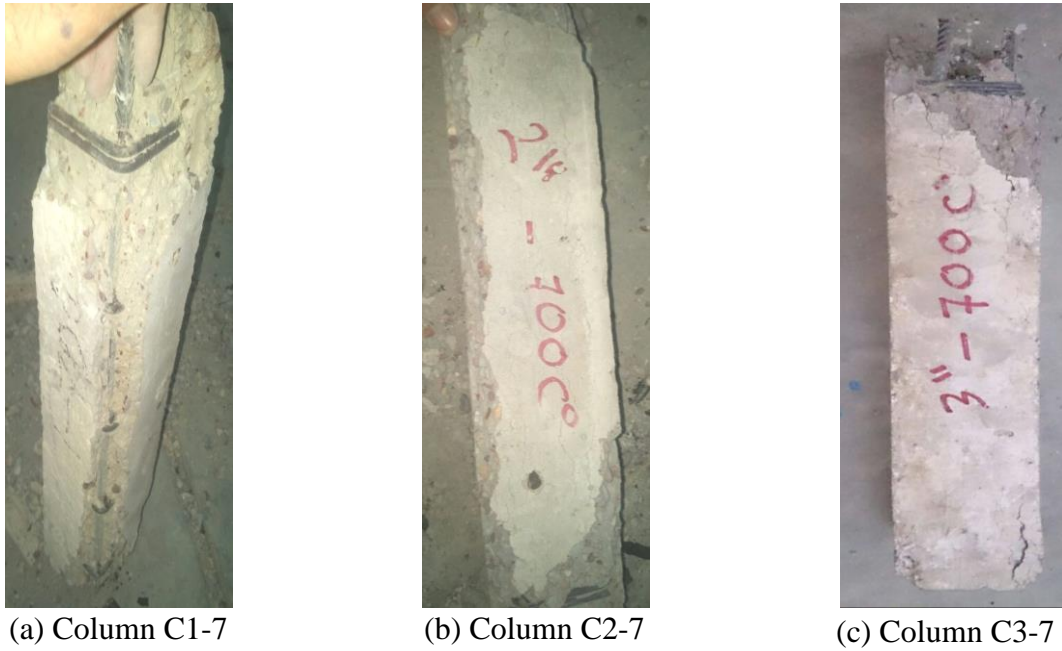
Crack Patterns for Specimens Exposed To 700 °C.
